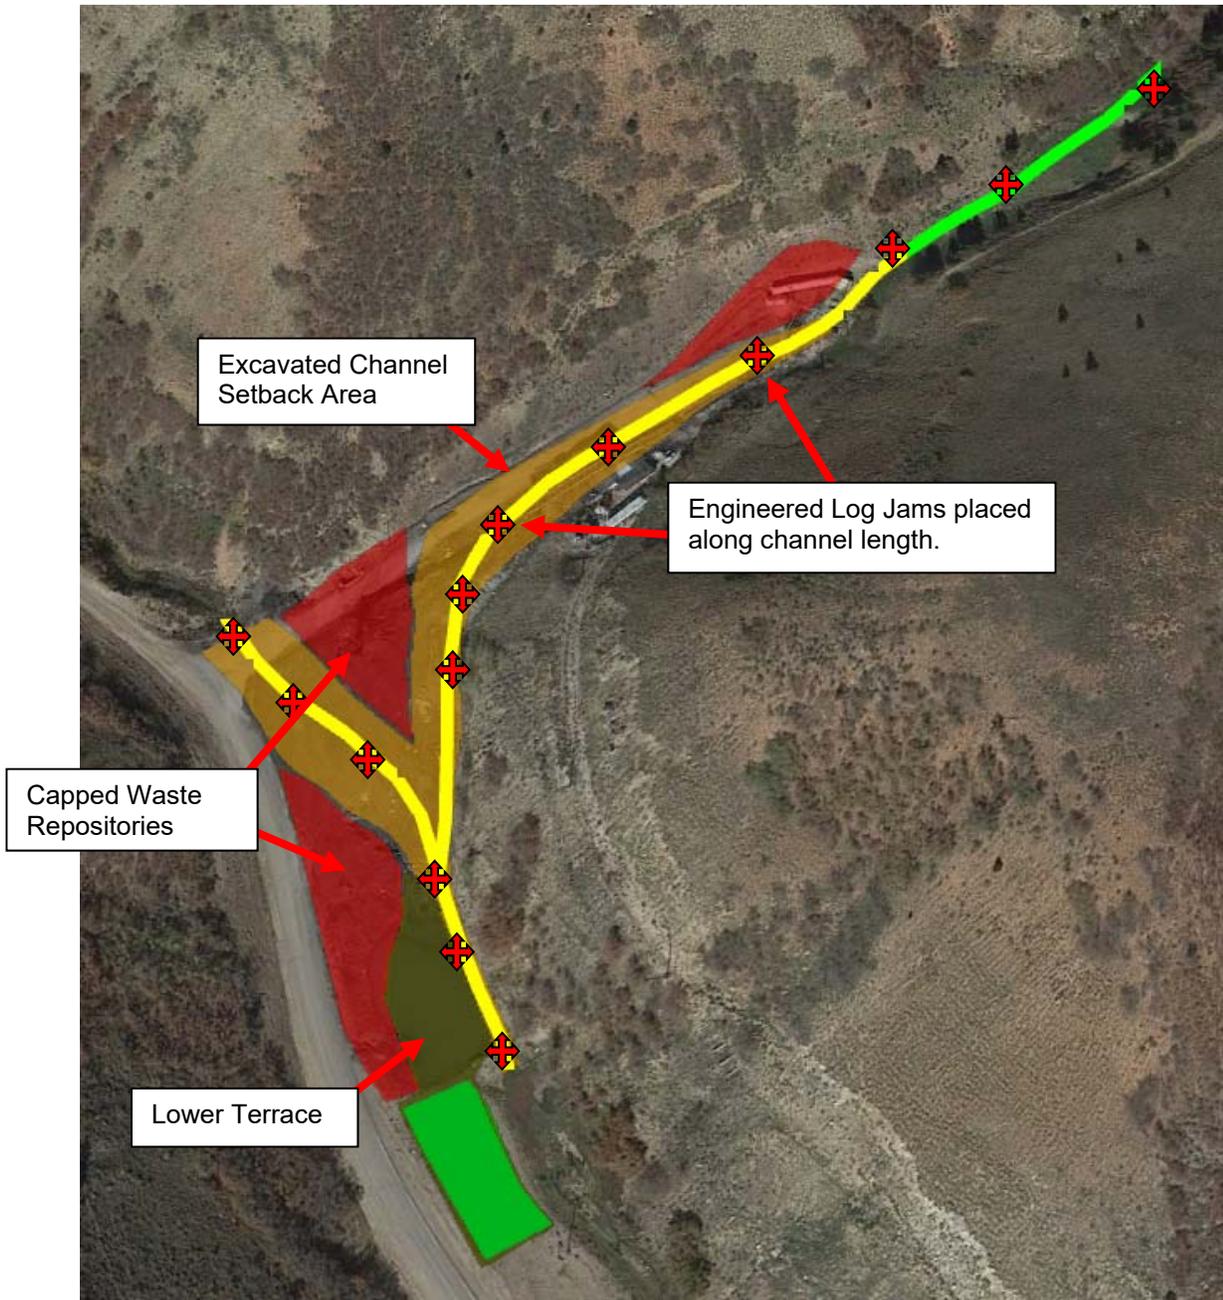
Yellow sections shall be riprapped. Green section shall be re-exposed natural channel or graded to a trapezoidal shape.  Engineered log jams shall be placed at locations shown. Placement of additional Engineered Log Jams shall be determined in the field.
